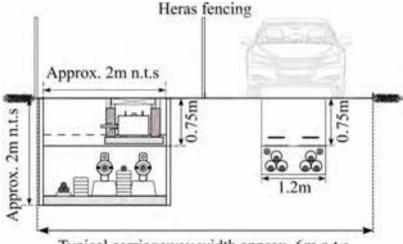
provides a typical cross section for a joint bay installed within a carriageway with no verge.
